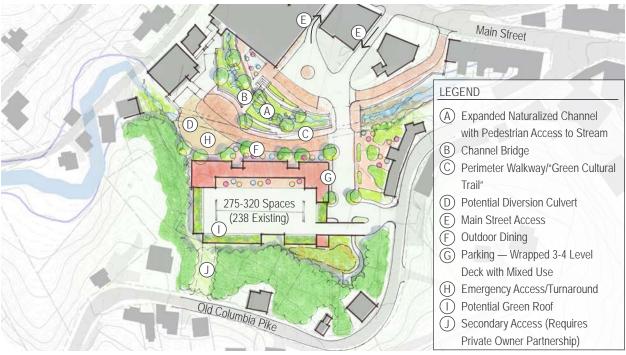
Parking Garage with Green Roof Elements, Mixed Use Space and Activated Channel
